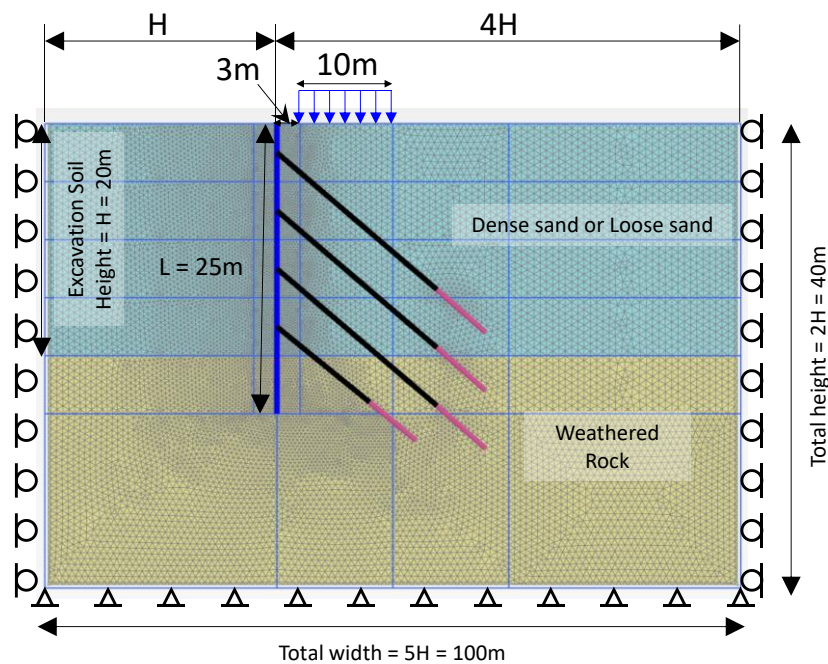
Typical 2D FE model for a retaining wall and earth anchor
